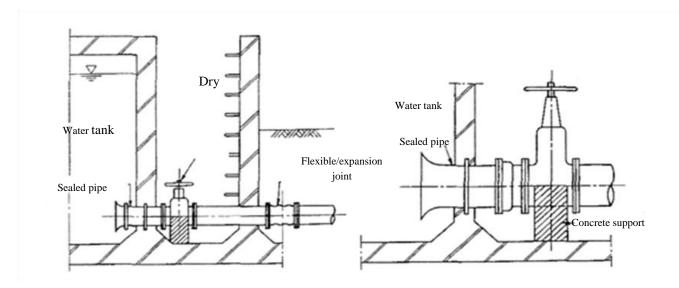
a typical example shoes how to cross pipes through tank/reservoir wall
